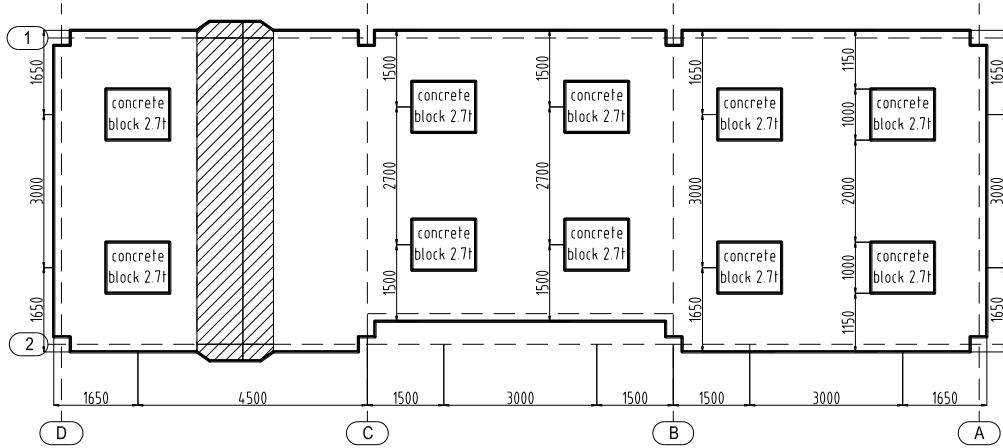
Concrete blocks on the specimen at the 3rd story
